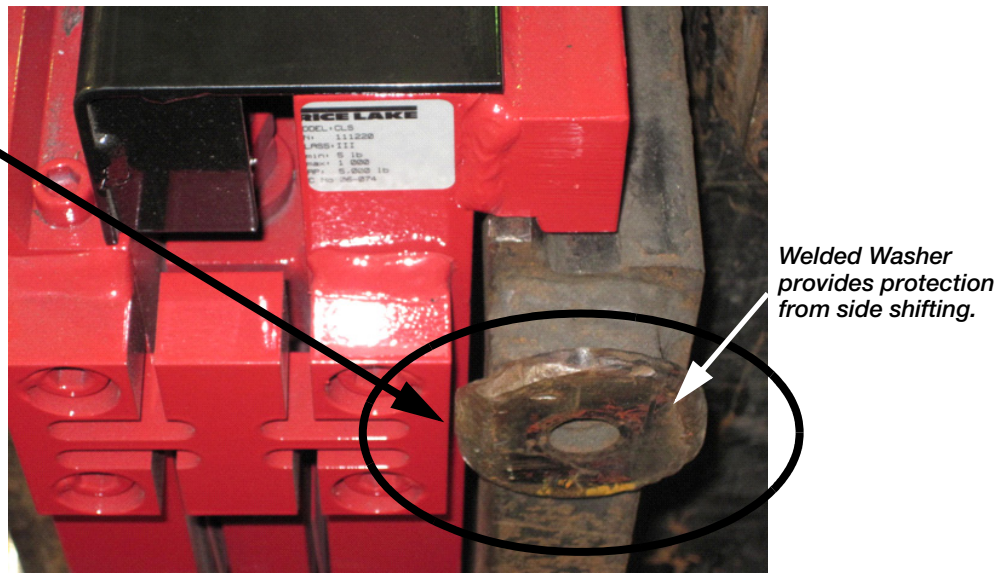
Welded Washer to Prevent Side Shifting
